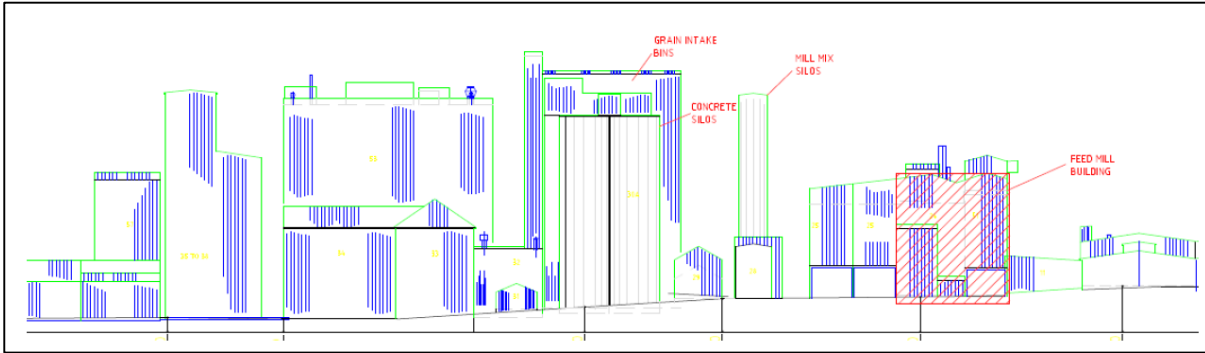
Existing elevations for all site buildings, alterations to the feed mill outlined in red.
